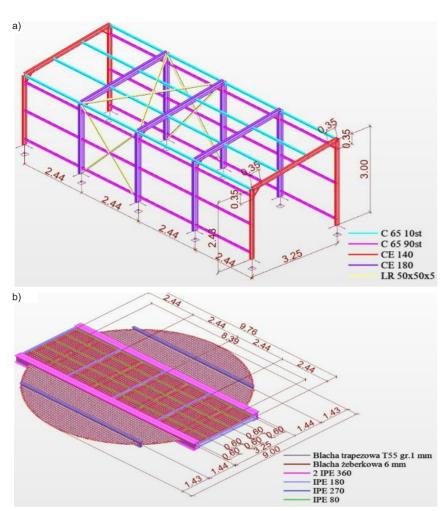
Calculation models for: a) gallery structure; b) silo floor structure Rys. 3. Modele obliczeniowe w zakresie: a) konstrukcji galerii; b) konstrukcji stropu silosu
